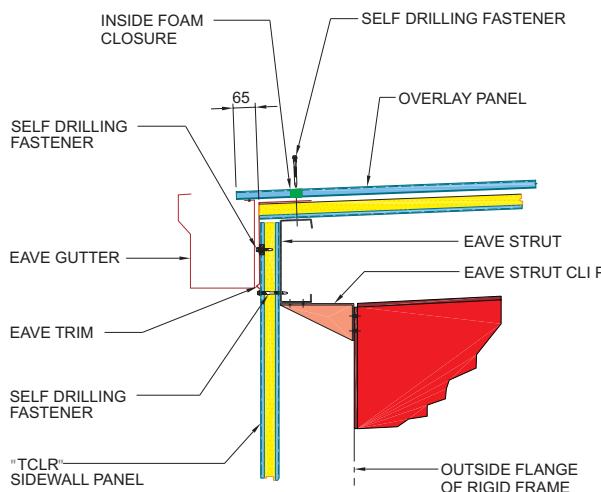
DETAIL-A : "TCMD" ROOF PANEL AT CORNER EAVE
